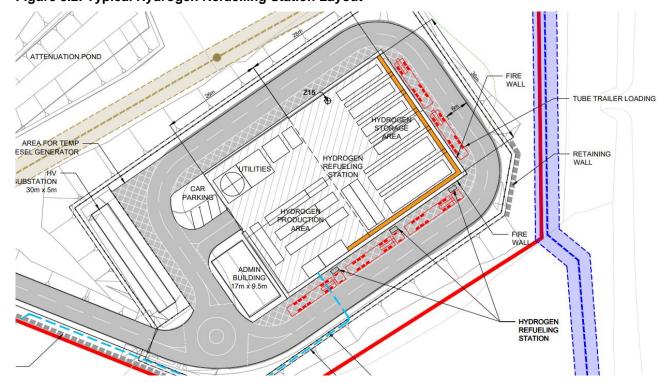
Typical Hydrogen Refuelling Station Layout
